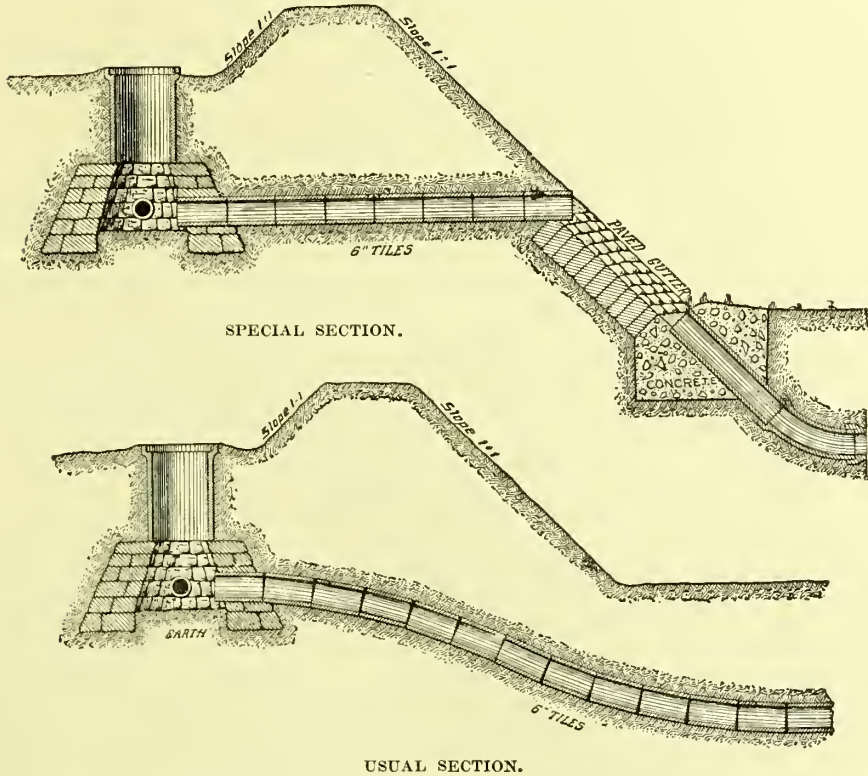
SECTIONS THROUGH TILE CHAMBERS AND UNDERDRAINS AT CHANGES OF GRADE AT EMBANKMENTS.
